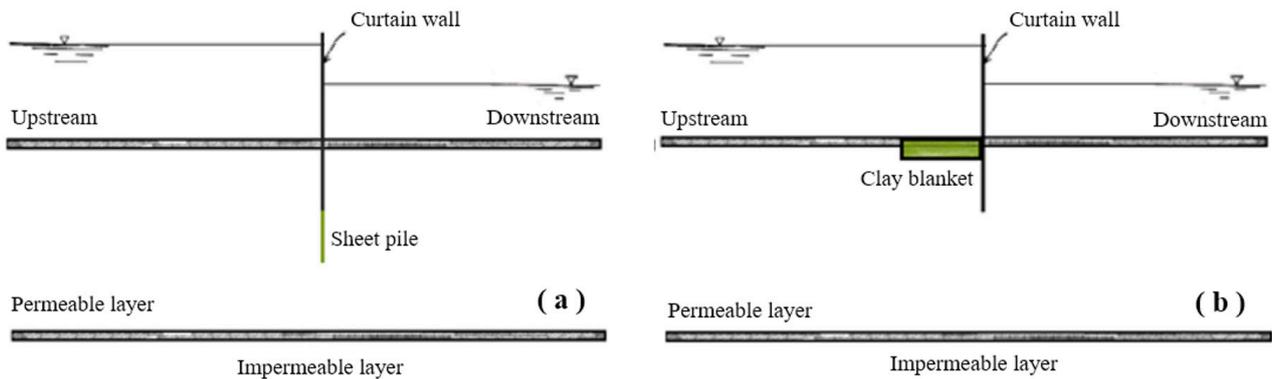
Schematic profile views of (a) sheet pile and (b) clay blanket examples
